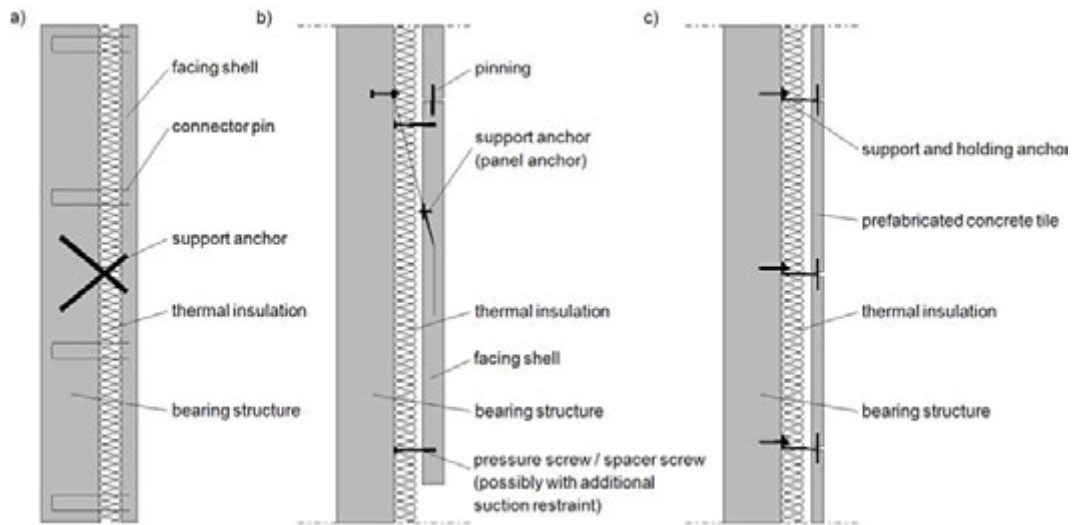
left: sandwich wall; middle: curtain-wall facing; right: cast-stone façade
